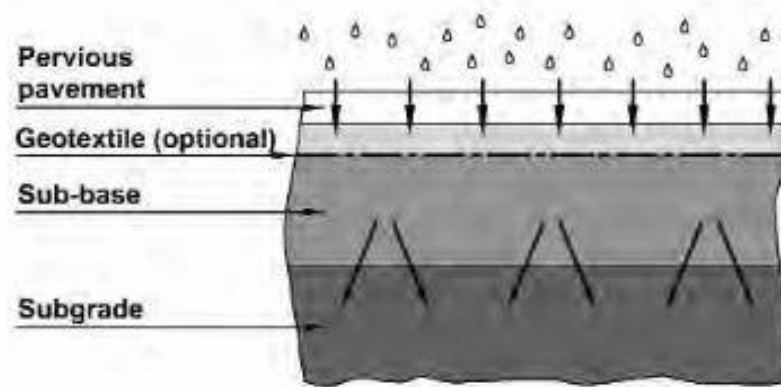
(a) Pervious pavement system types: Type A – Total Infiltration
